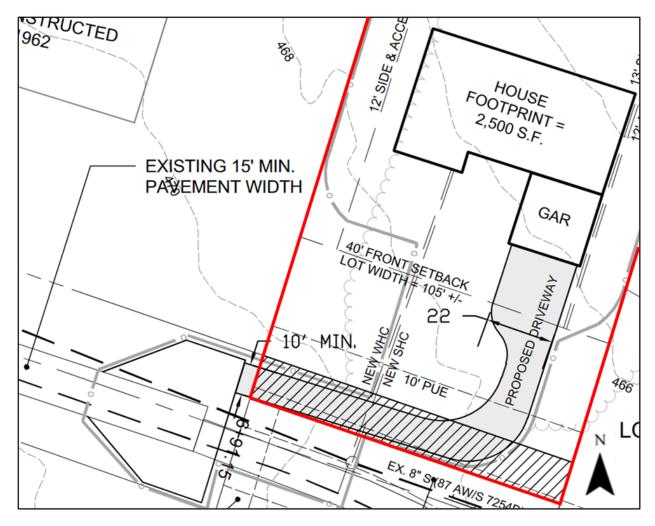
Pre-Preliminary Plan Layout, Temporary Turnaround & Driveway
